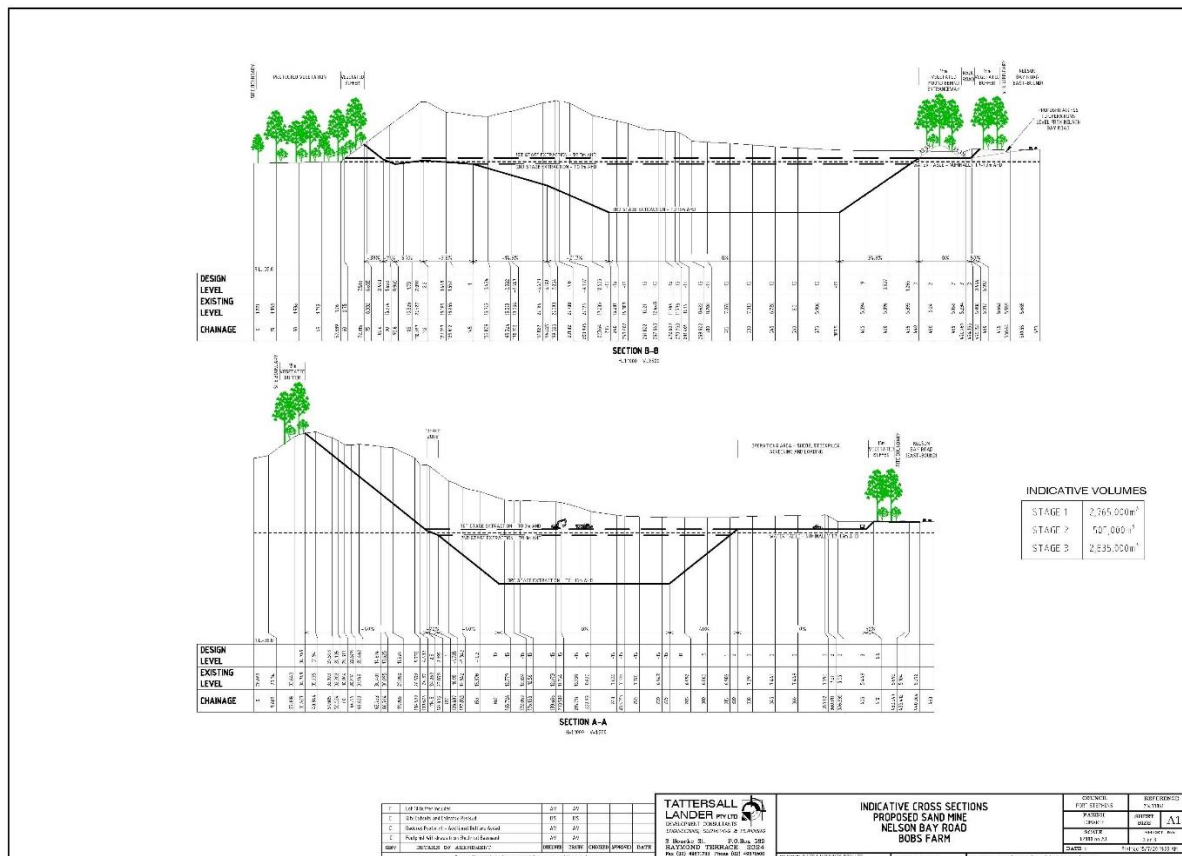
Cross Sections A-A & B-B (Tattersall Lander, 2020)
